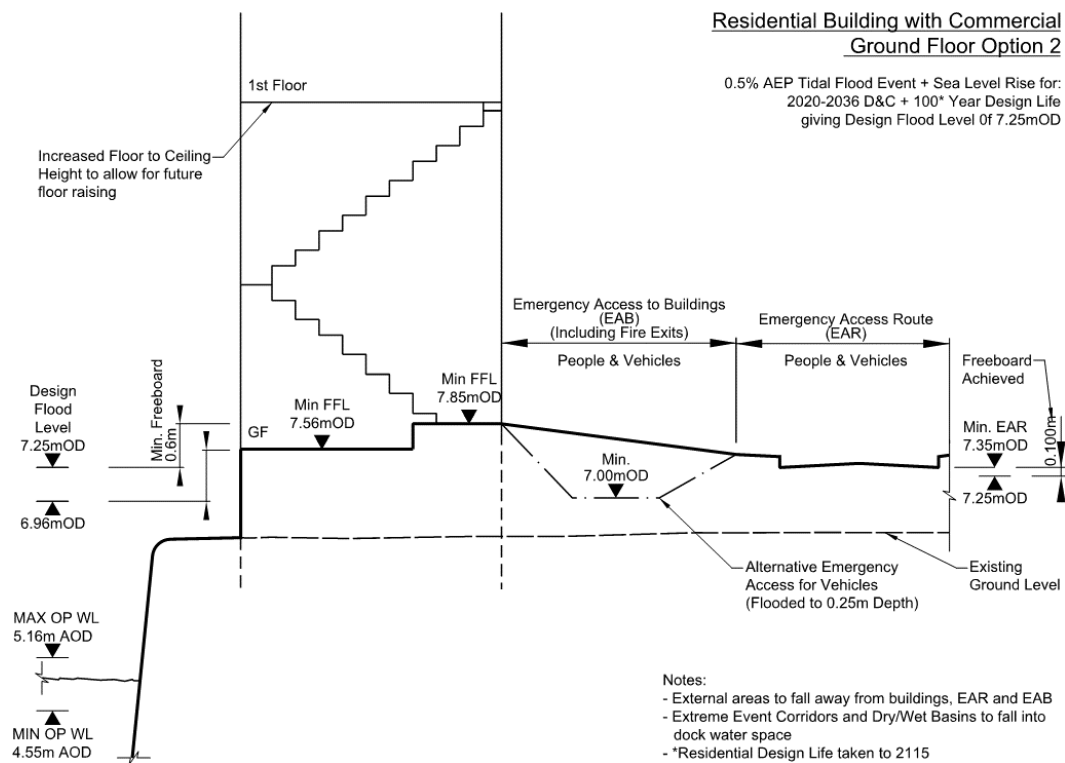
Residential Building with Commercial Ground Floor Finished Levels - Option 2
